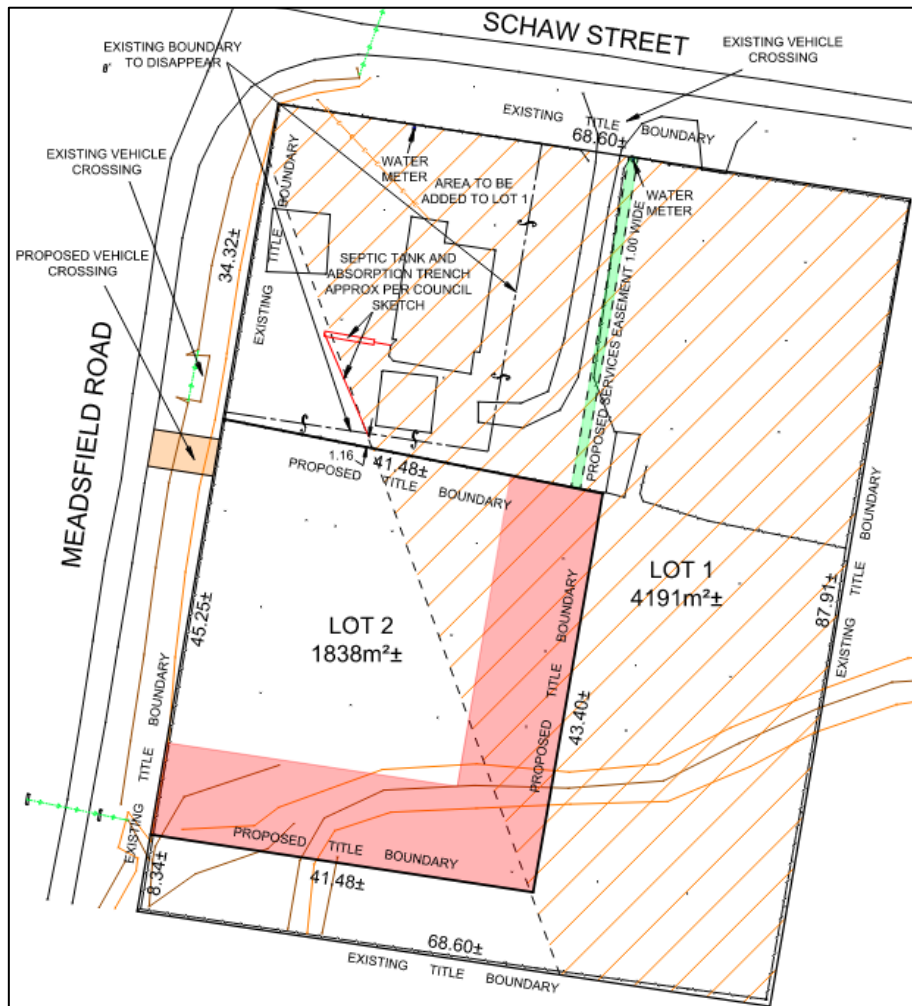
Proposal Plan. Source: Nova Land Consulting
